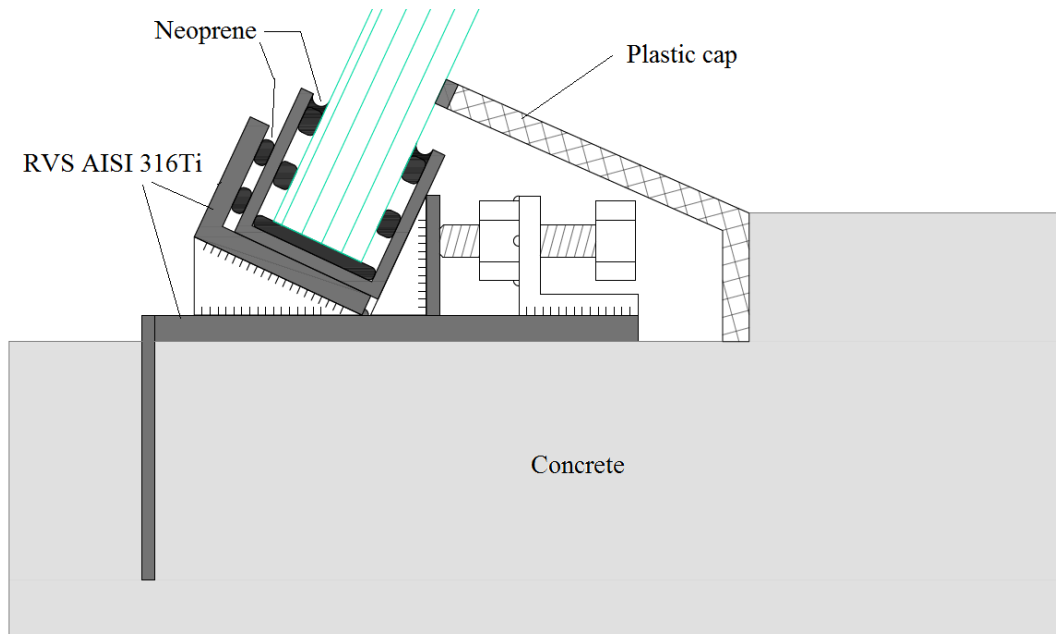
Example detail of the glass frames at the connection with the concrete wall
